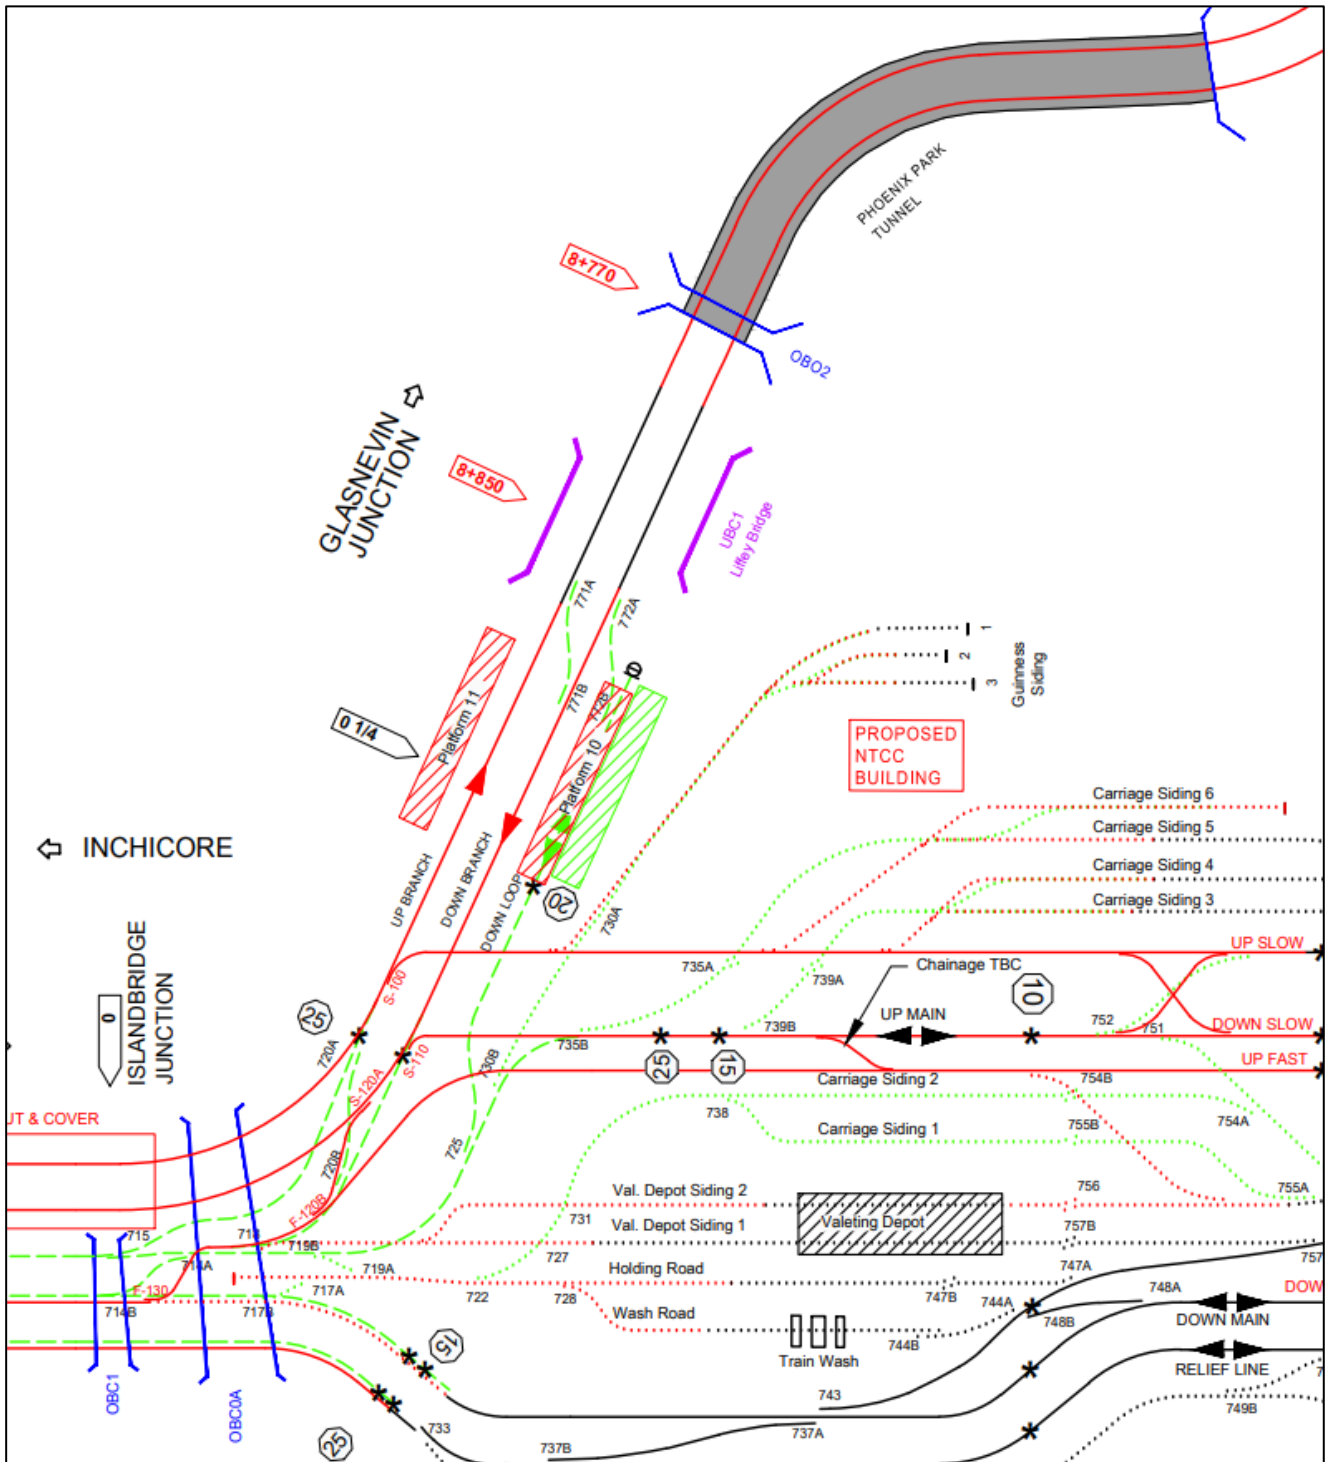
St. John's Road Bridge (OBC0A) to East of Phoenix Park Tunnel – Track Plan Layout
